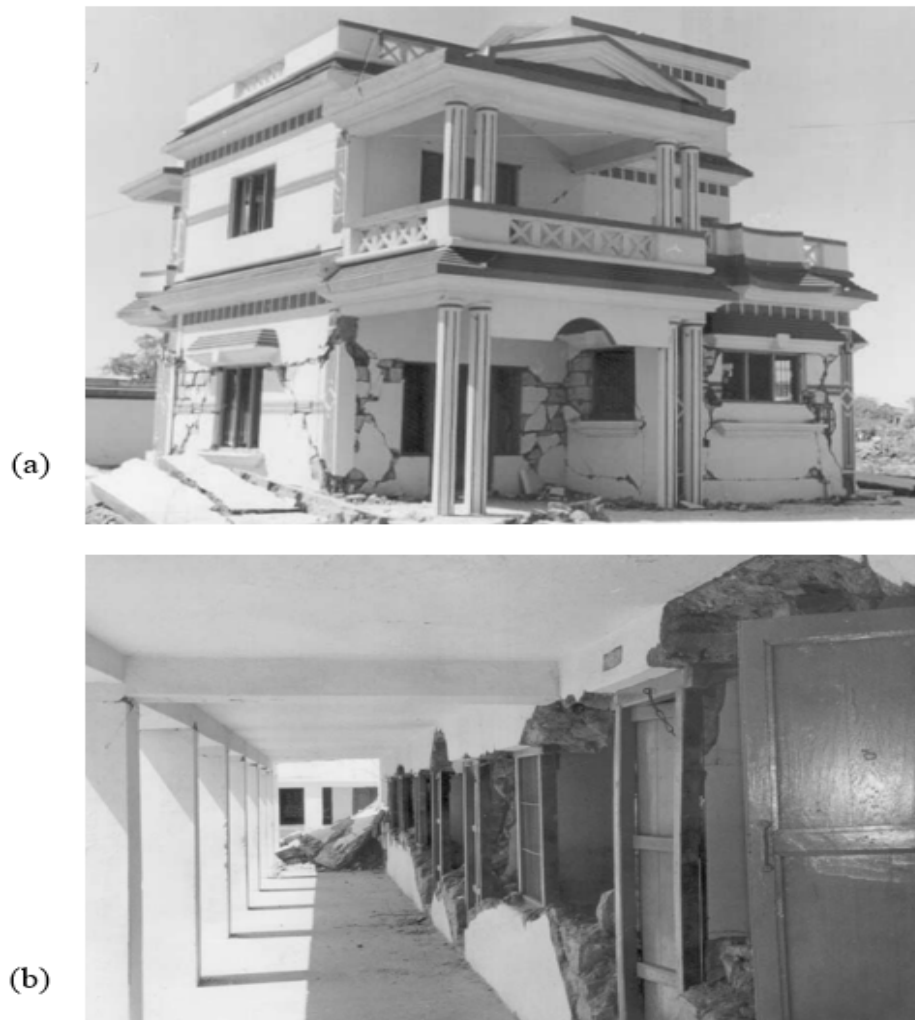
Failure of masonry building having vertical and horizontal stiffeners: (a) cracks below band beam, and (b) collapse of wall between opening [60].
